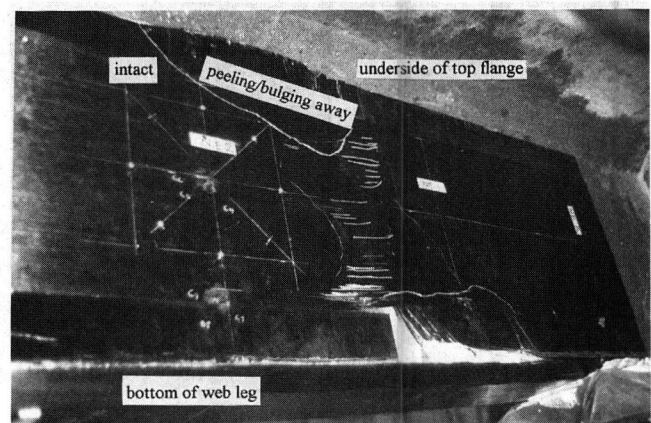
Interior face of one web leg, after failure (Girder 2, Test 1).
